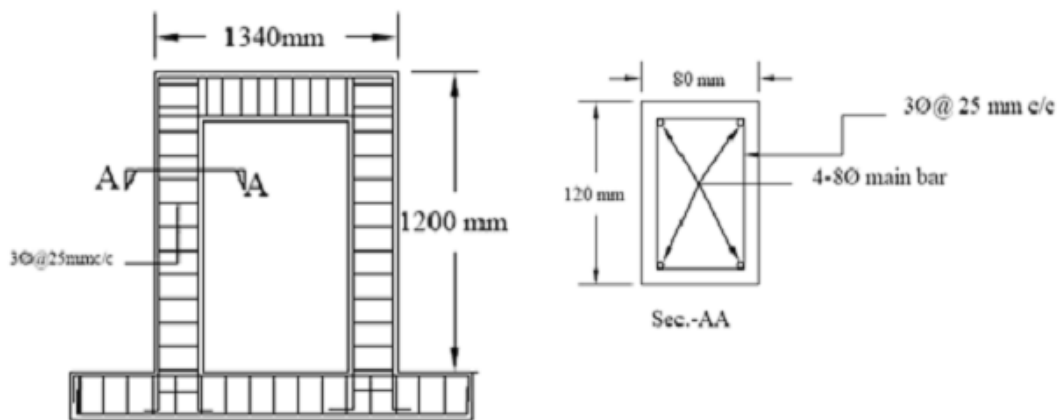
Details of the reinforced concrete bare frame (Paul and Agarwal, 2012)
